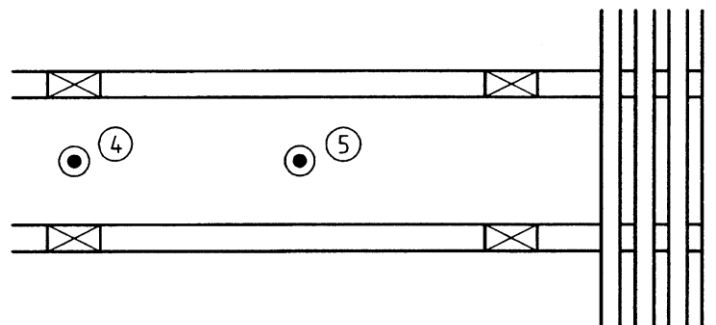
Surface-elastic floors with elastic construction (with one sprung beams layer and non-staggered supports)
